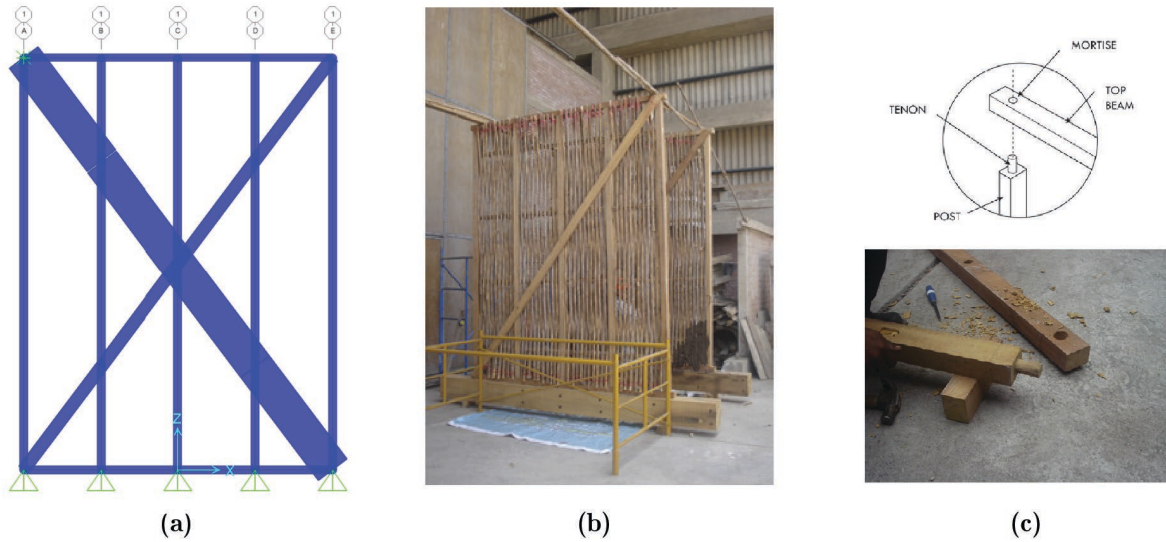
Model based on ESM of the full-scale infilled *quincha* frame (a), and view of the specimen (b) from Torrealva et al. (2018), with detail of the mortise-and-tenon connection (c).
